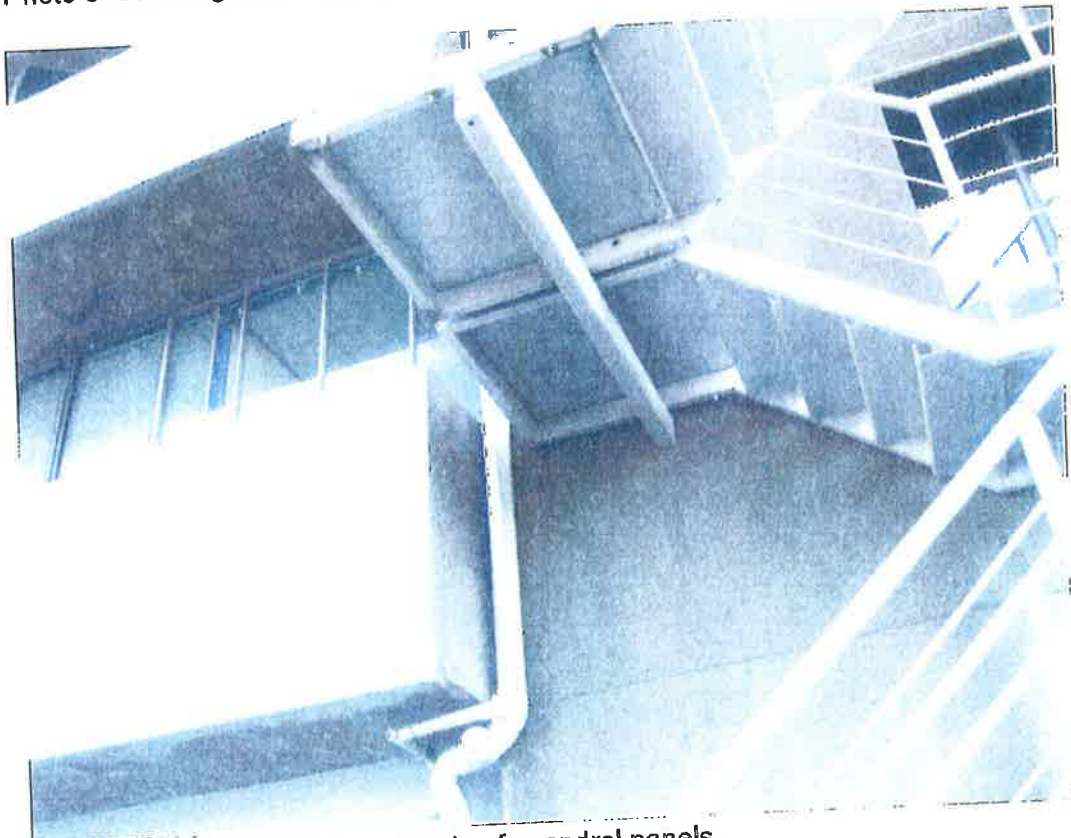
Spalling of plaster off ends of spandrel panels.
